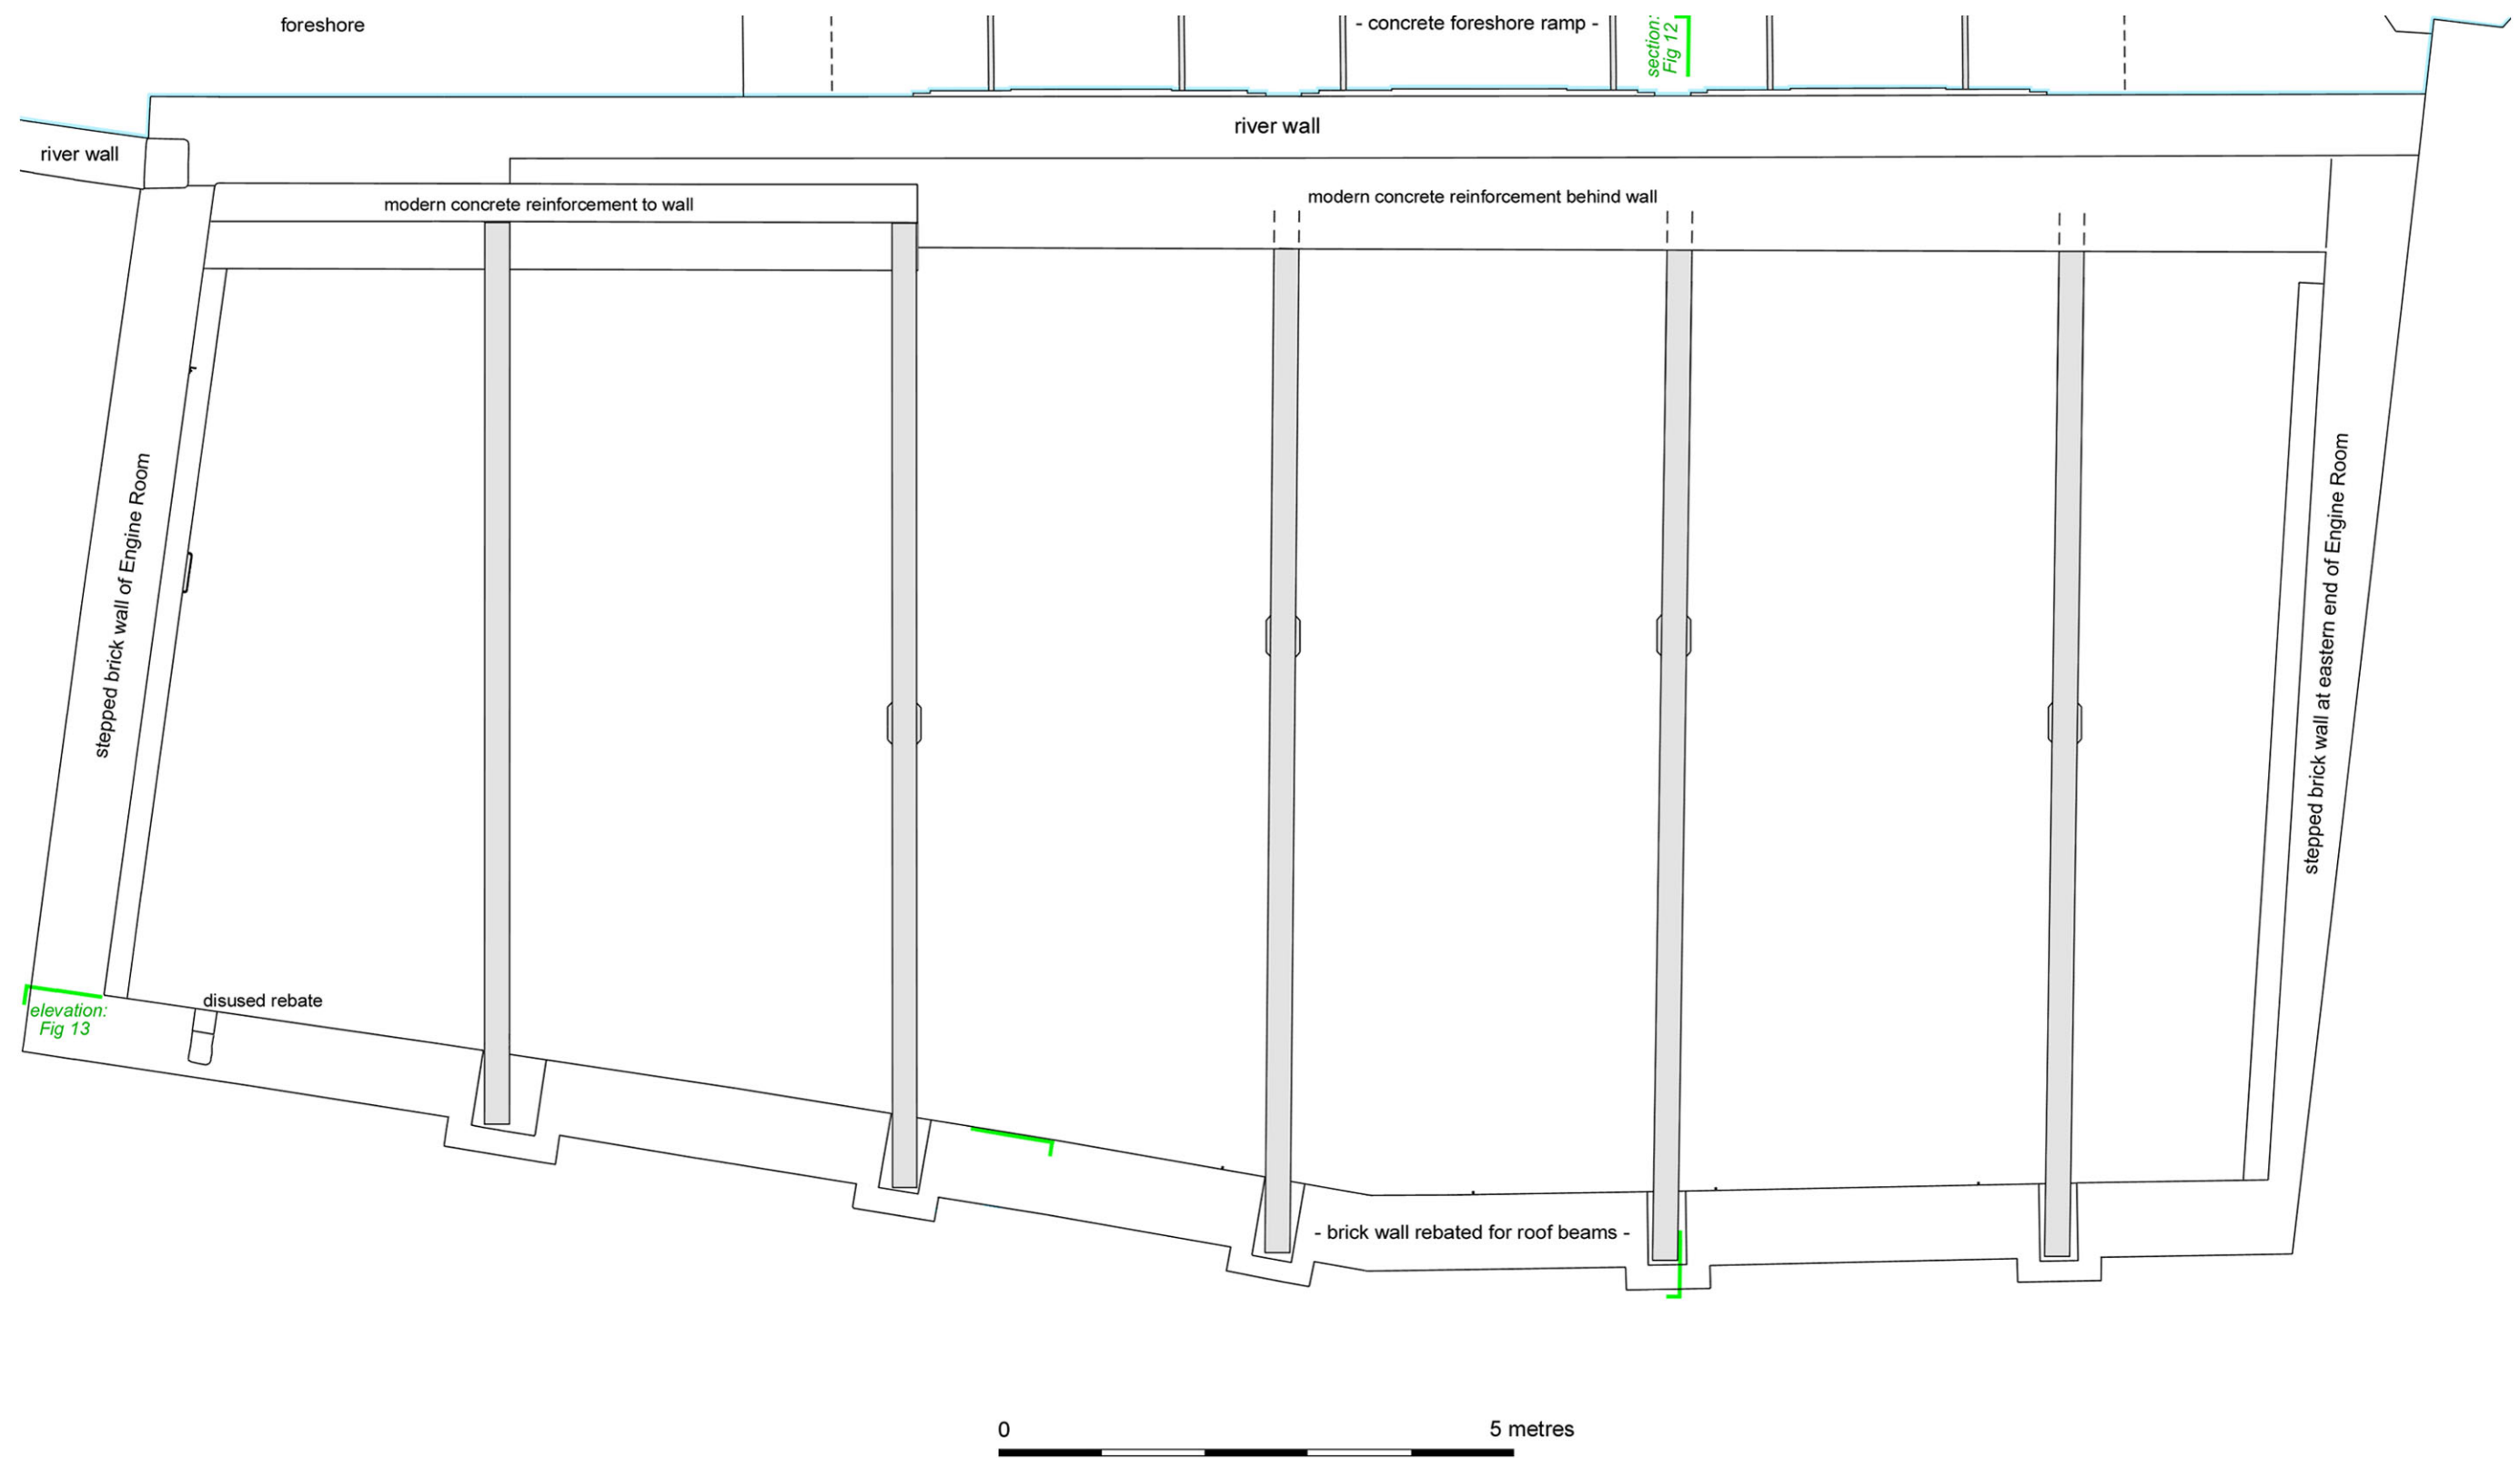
Plan showing the principal roof beams (shaded) within the Engine Room
